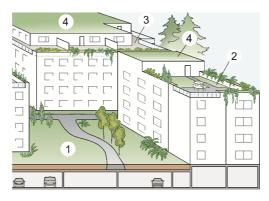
Applications of green roofs in a typical construction project: 1) Intensive green roof, forming a lawn or park area, 2) Semiintensive green roof, creating a «rooftop garden», 3) Blue-grey roof, allowing both roof traffic and water detention, 4) Extensive green roof on building rooftops, not intended for public access. Illustration: Klima 2050/SINTEF.
